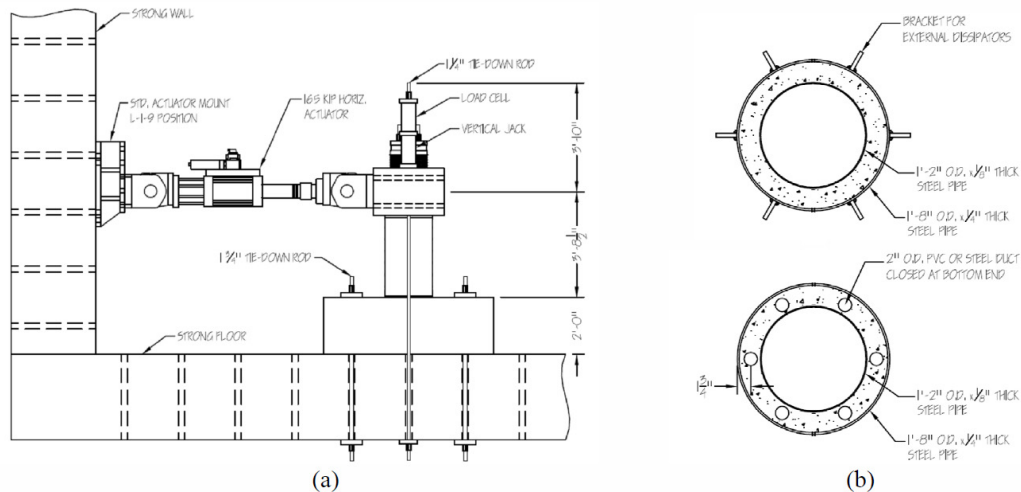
Specimen drawings: (a) test setup; and (b) column base cross sections for Unit 1A (top) and Unit 1B (bottom).
